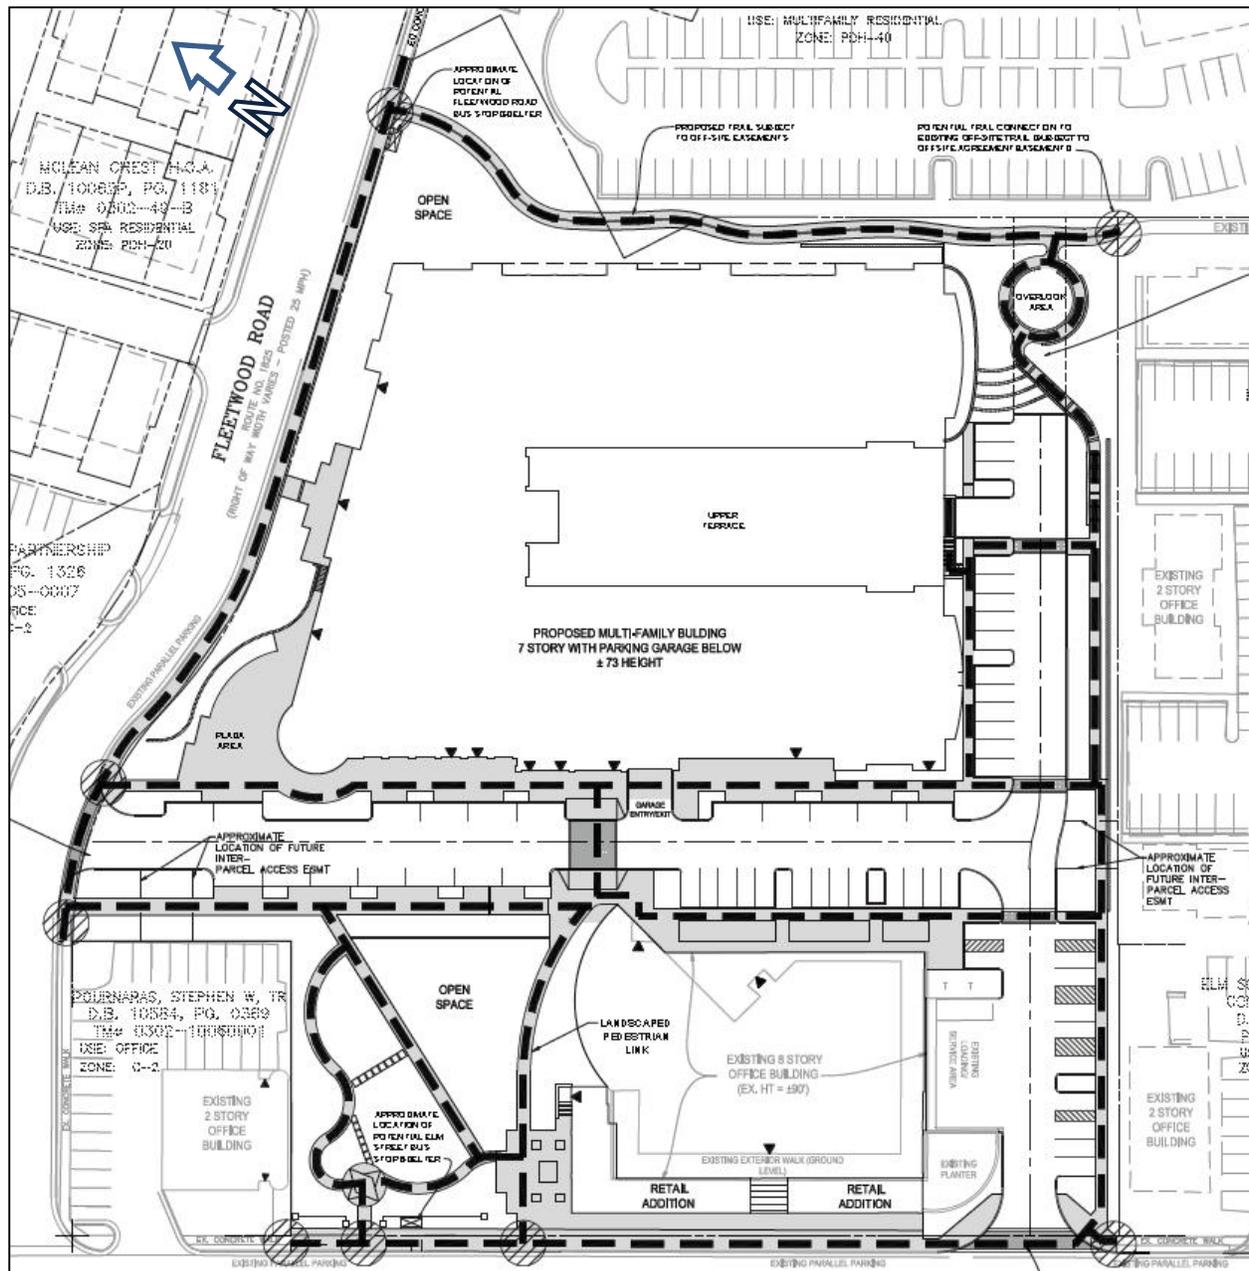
Sheet 15 of the CDP/FDP displays the pedestrian paths throughout the proposed site design (Source: Bowman Consulting, June 1, 2014)
